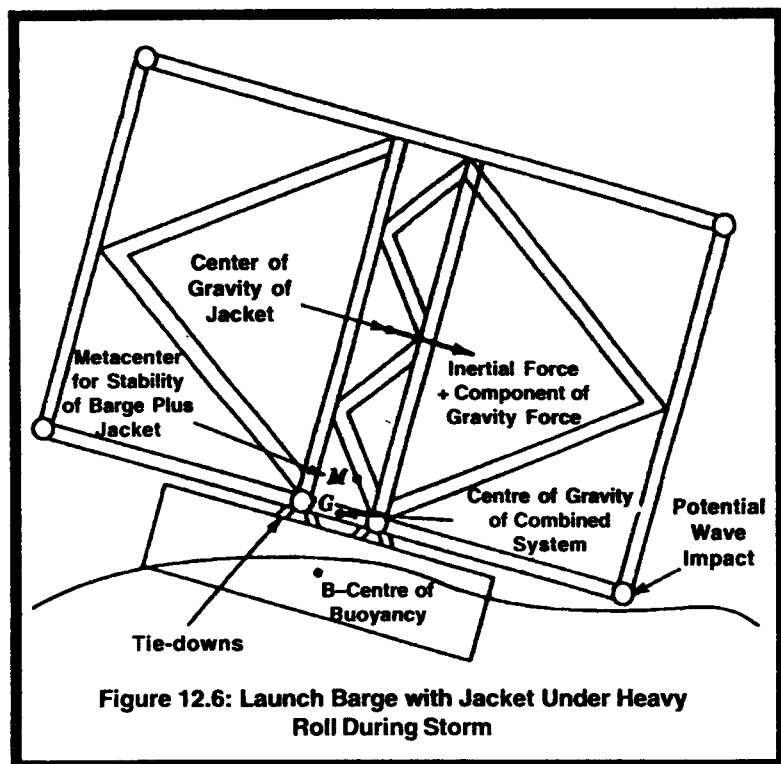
Launch Barge with Jacket Under Heavy Roll During Storm
